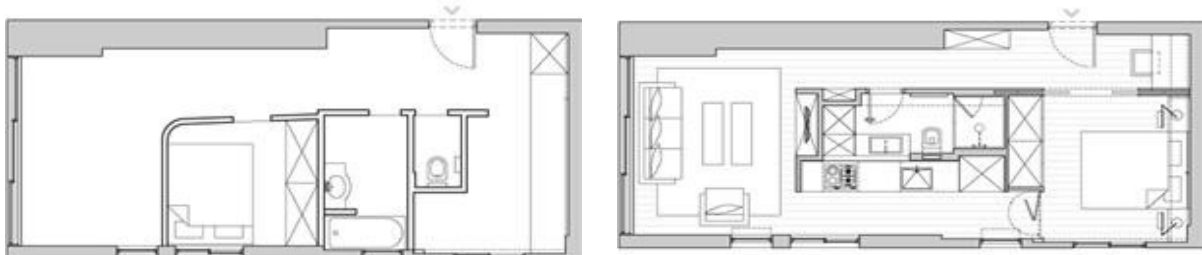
(Left): Layout of the space before intervention. Picture source: [<http://www.sfaro.co.il/> (accessed 23th February 2014)]; Fig.6.1.9. (Right): Layout of the space after intervention. Picture source: [<http://www.sfaro.co.il/> (accessed 23th February 2014)].
